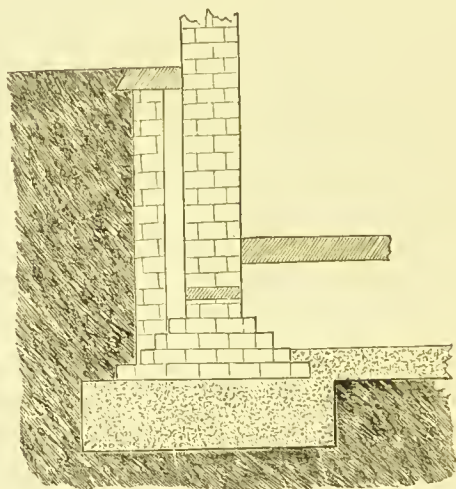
HOUSE FOUNDATION WITH DAMP-PROOF COURSE IN WALL AND DRY AREA.
